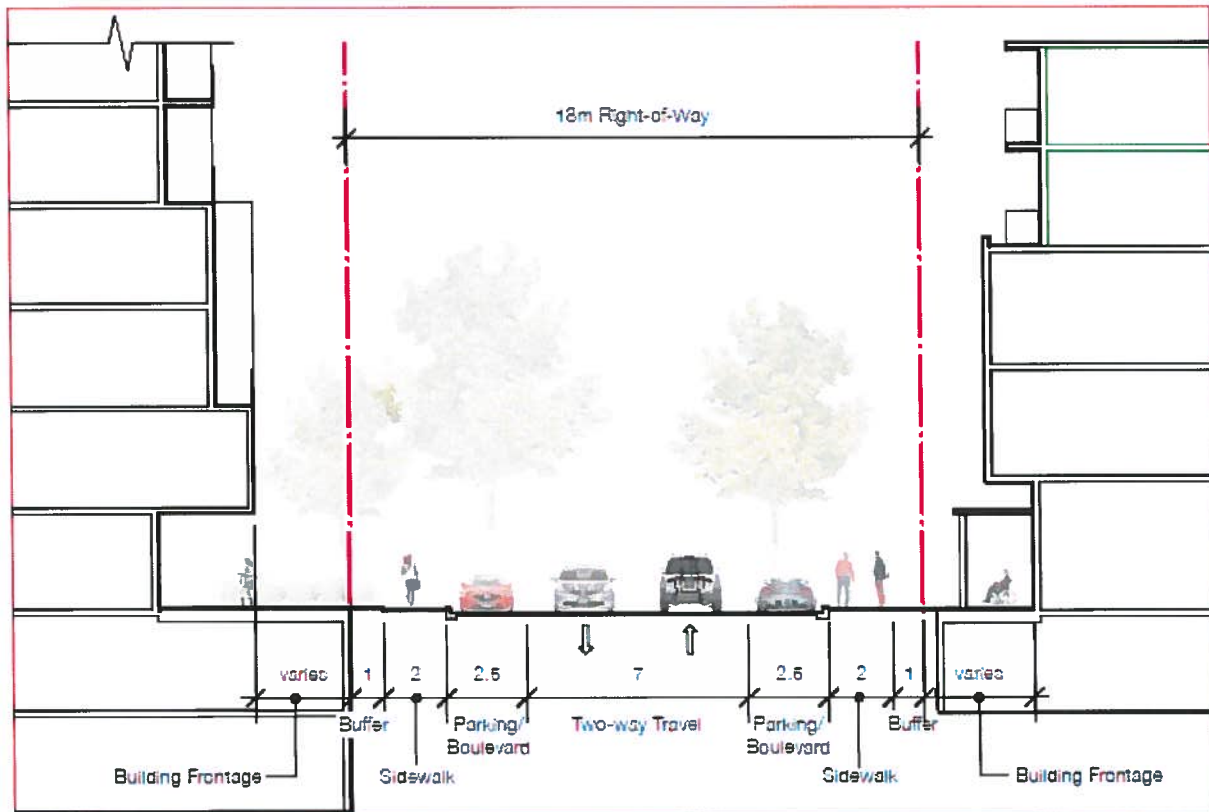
Vernon Avenue Cross Section – North of Nigel Gate (see Figure 2) (from plans by D'Ambrosio Architecture and Urbanism)
